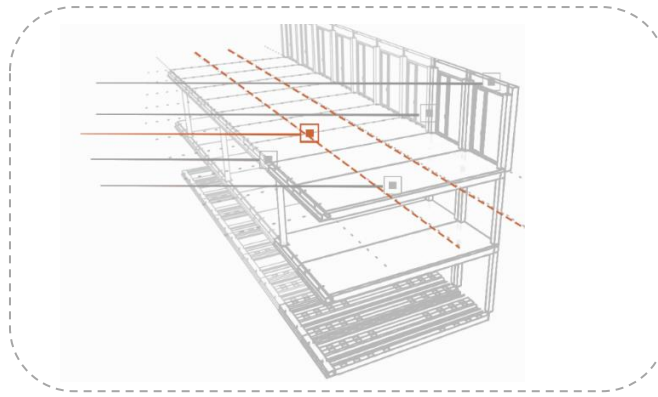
The grid of the prefabricated timber-hybrid slab panel. (Sustainable building systems | timber hybrid office buildings - CREE Buildings,)
